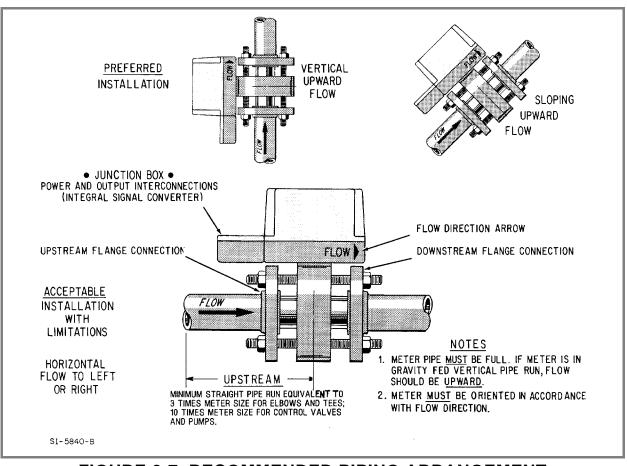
RECOMMENDED PIPING ARRANGEMENT
